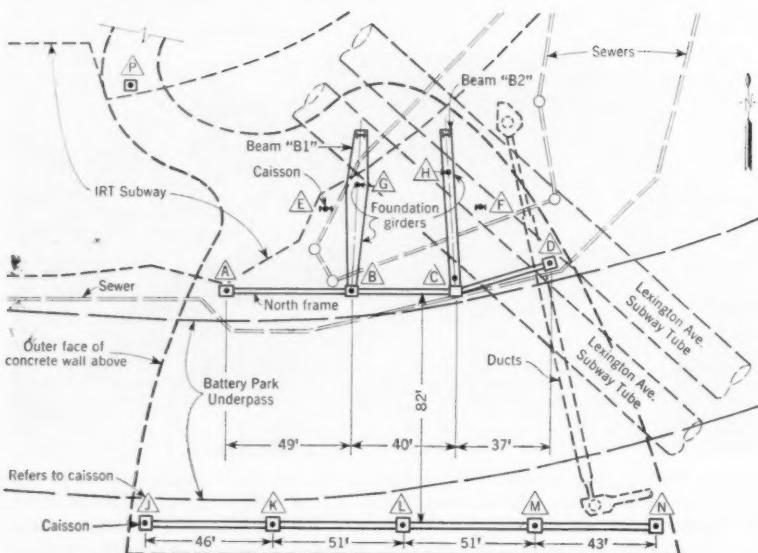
Subsurface locations of foundation girders and tie beams for reinforced concrete frames are shown, as well as major underground structures.
